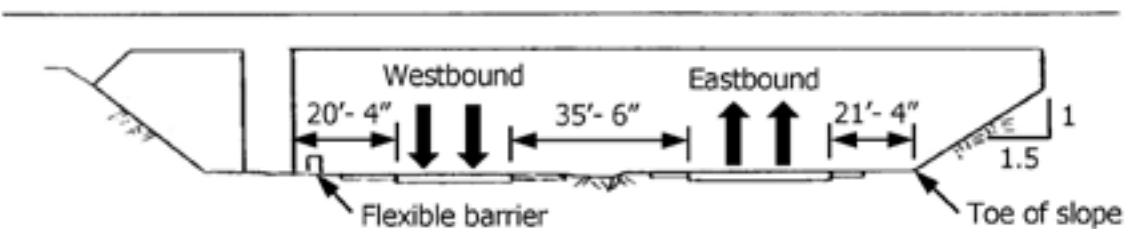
Bridge elevation view of horizontal clearances for separate westbound and eastbound highway features below the bridge, with a flexible barrier.
